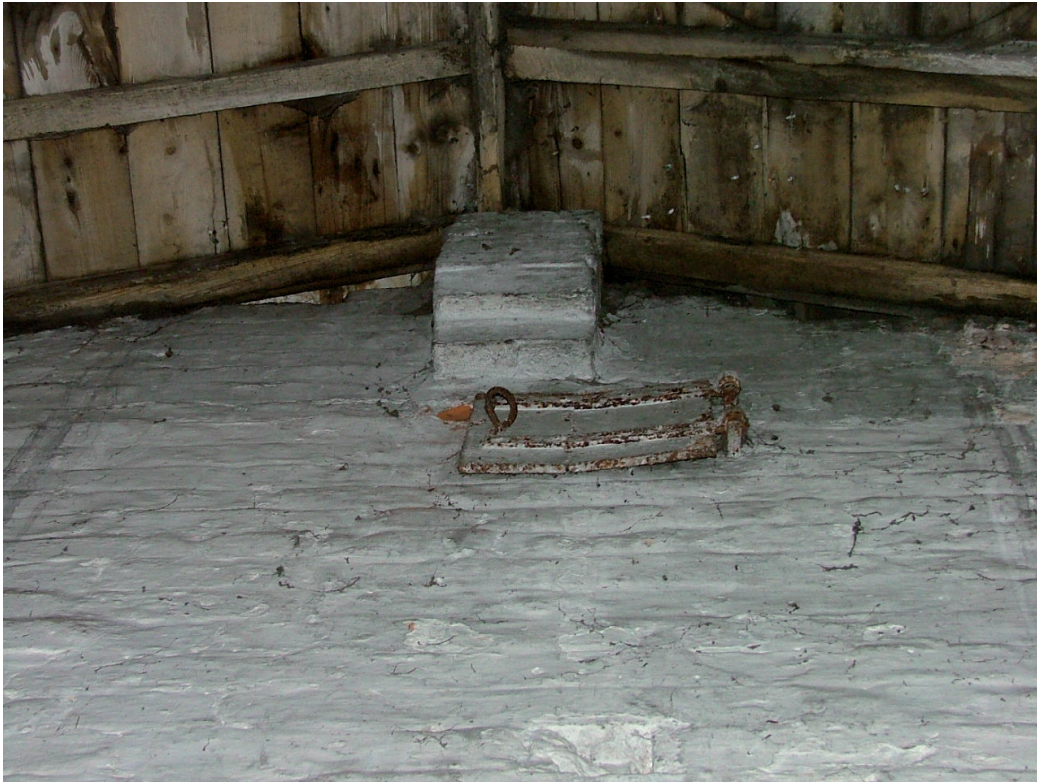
Brick support for ridge beam and small iron door, apex of gable as viewed from southern end of building
